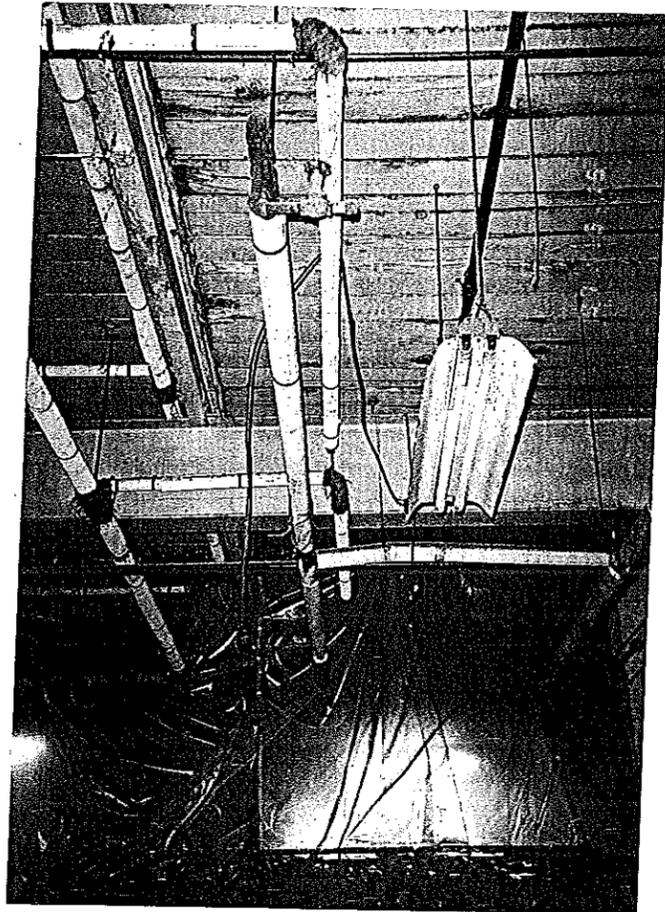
Asbestos Pipe Insulation in Boiler Room #7
